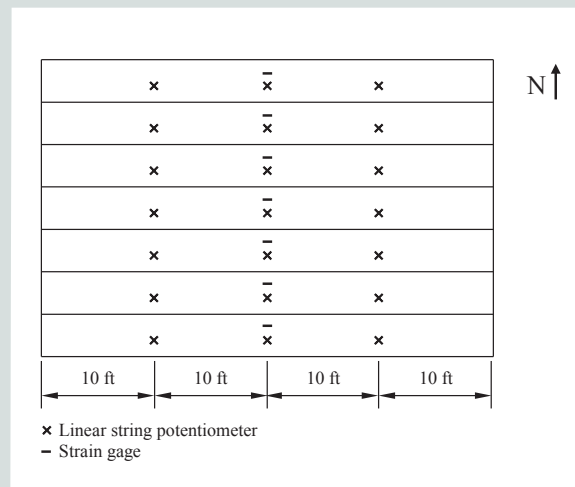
Instrumentation plan. Note: 1 ft = 0.305 m.
